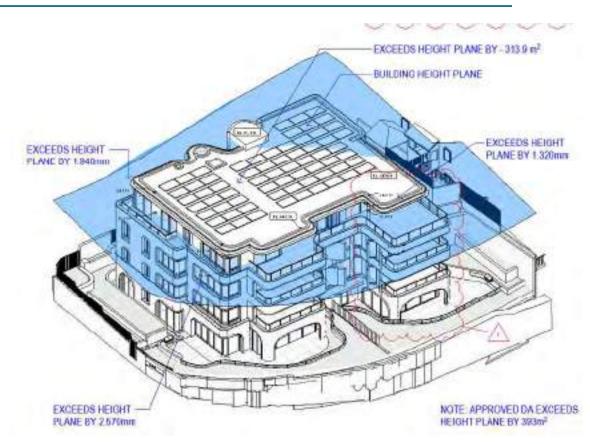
Extract of height plane diagram notating the heights of the building at various points across the building envelope (Source: Squillace, Sept 2024)
